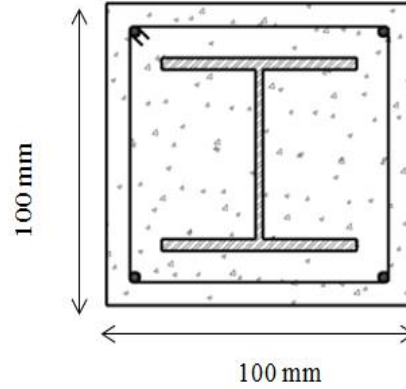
Cross-section from test specimen (Rahman, 2016)
